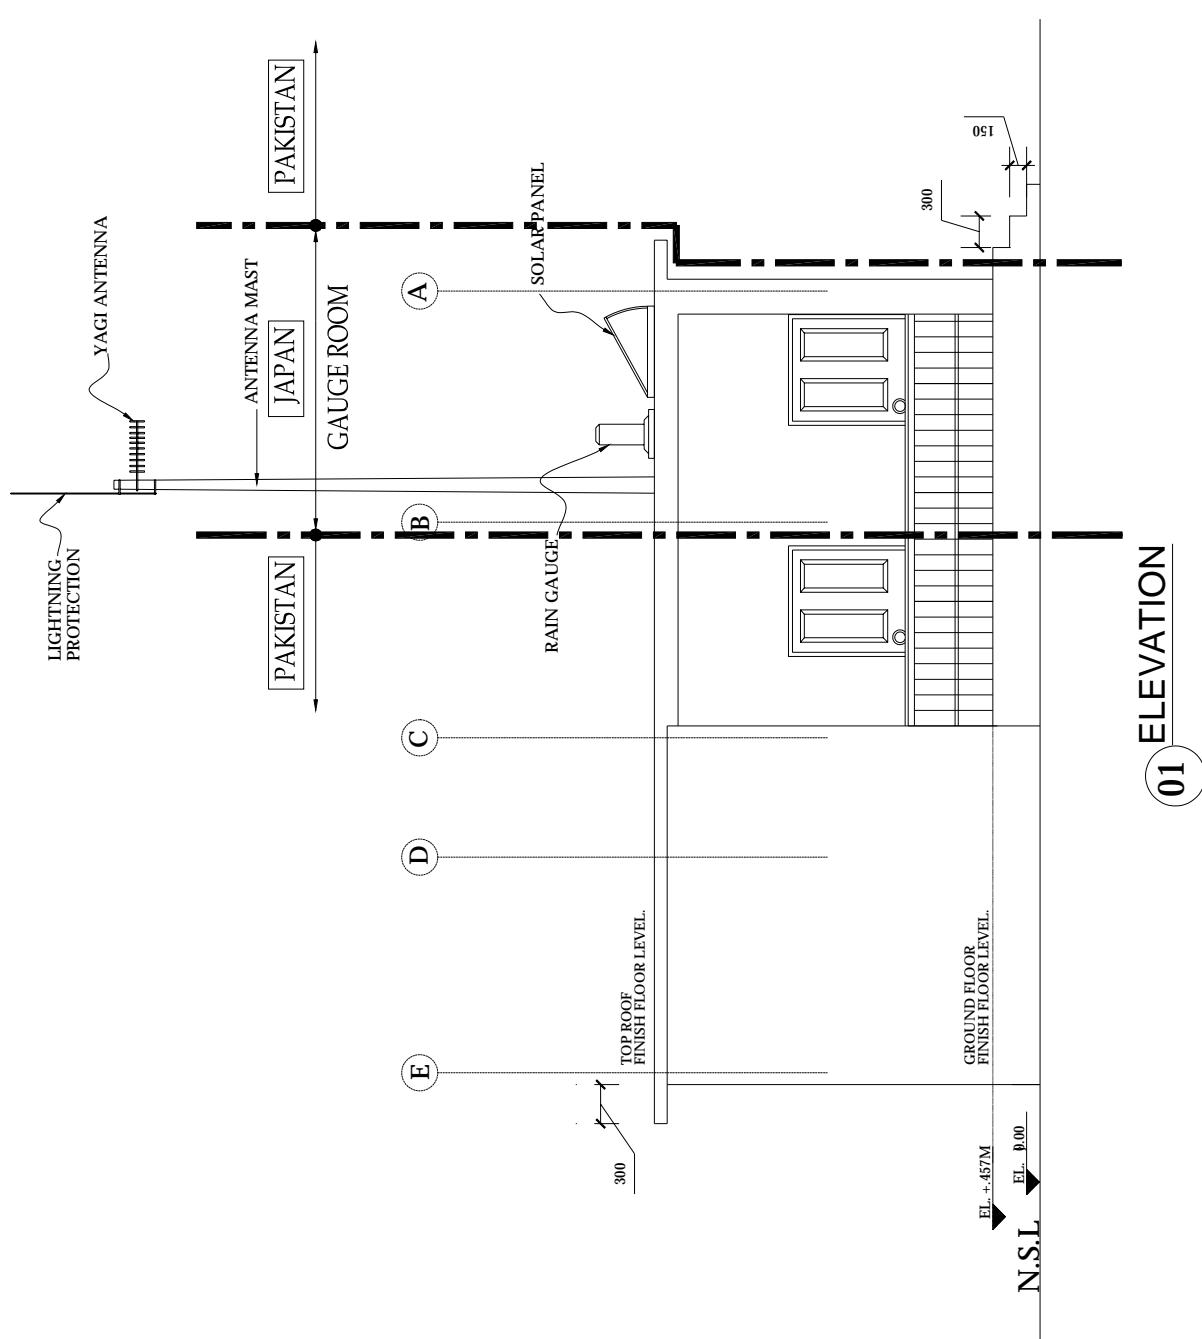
Elevation of Rainfall Gauging Station (Bokra)
